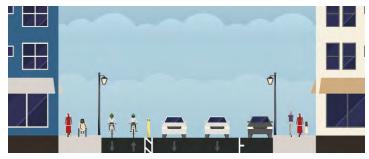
Proposed conditions on St. Peter Street between 6th Street and Exchange, and between 10th Street and 11th Street (looking north).
